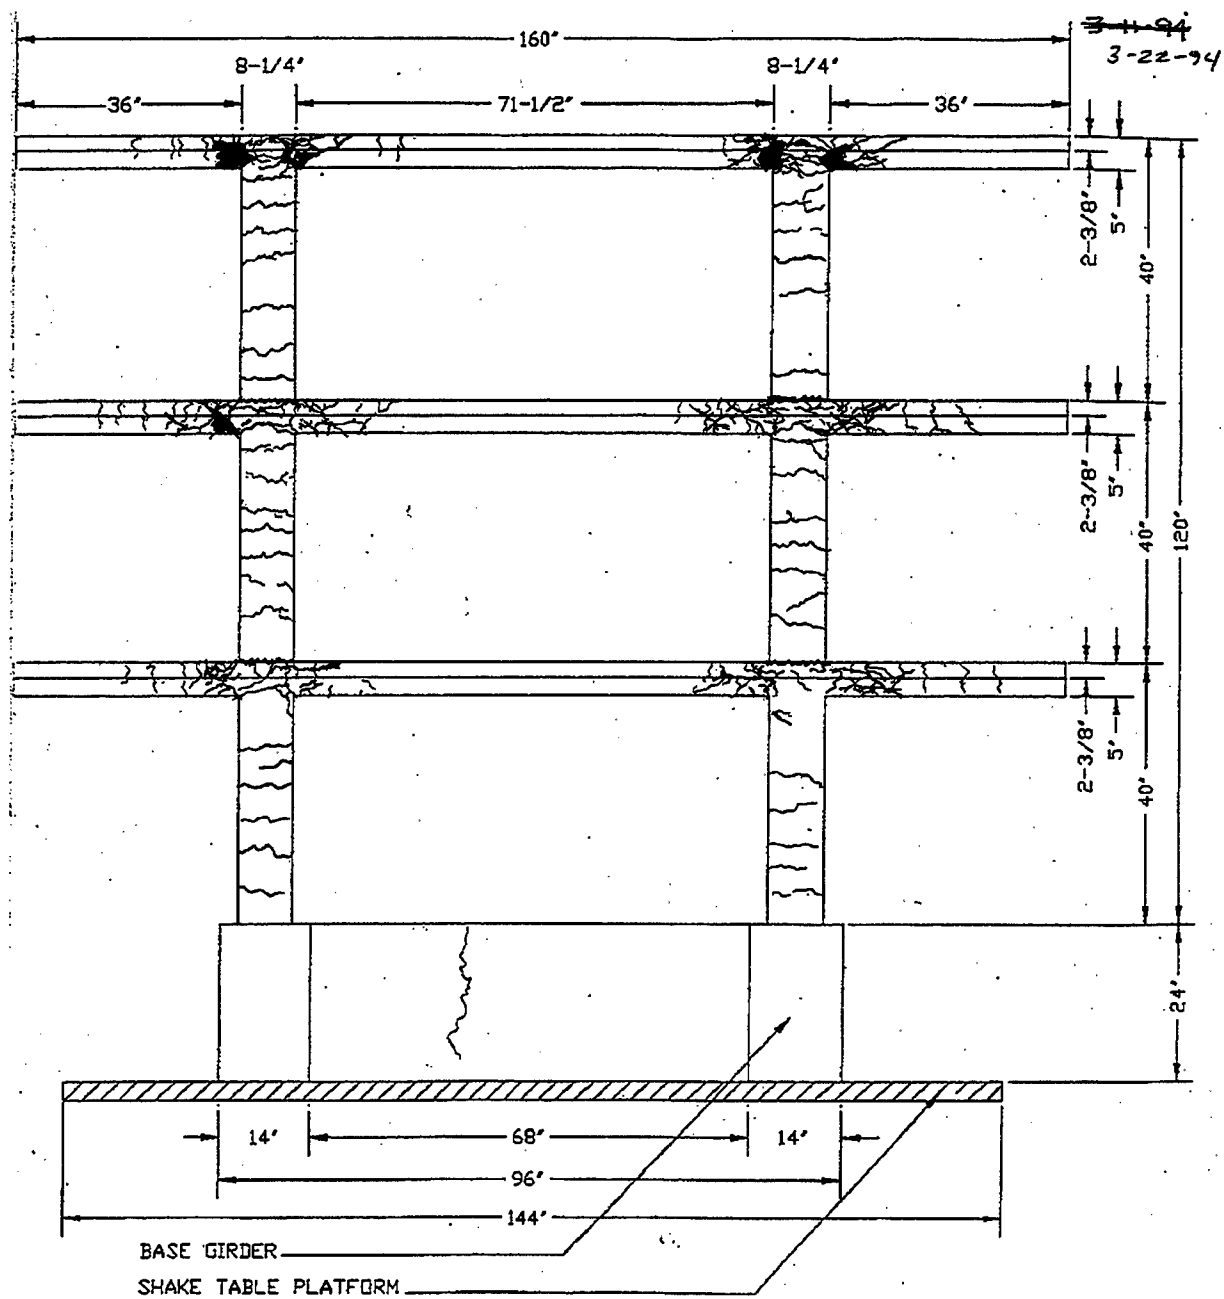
Crack Pattern, South Side of South Columns, Post-E200N
